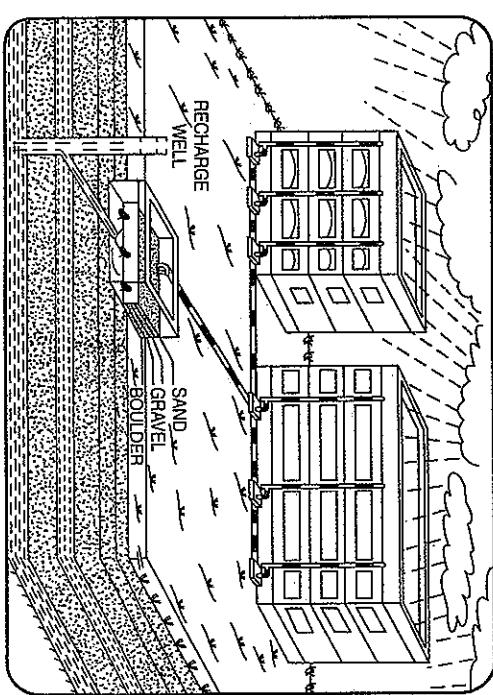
Roof top rain water harvesting through existing tubewells
